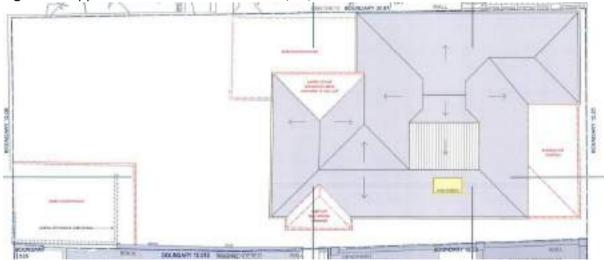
Approved Roof Plan demolition in DA300/19. Retained skylight highlighted yellow.
